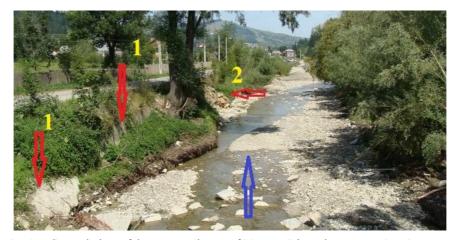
General view of the structural state of Voroneț River shore protection, in contact with DJ 177D in Voroneț District: 1 – completely degraded concrete slabs; 2 – erosion areas of road shoulder and road structure (Photo Luca, 2016).
